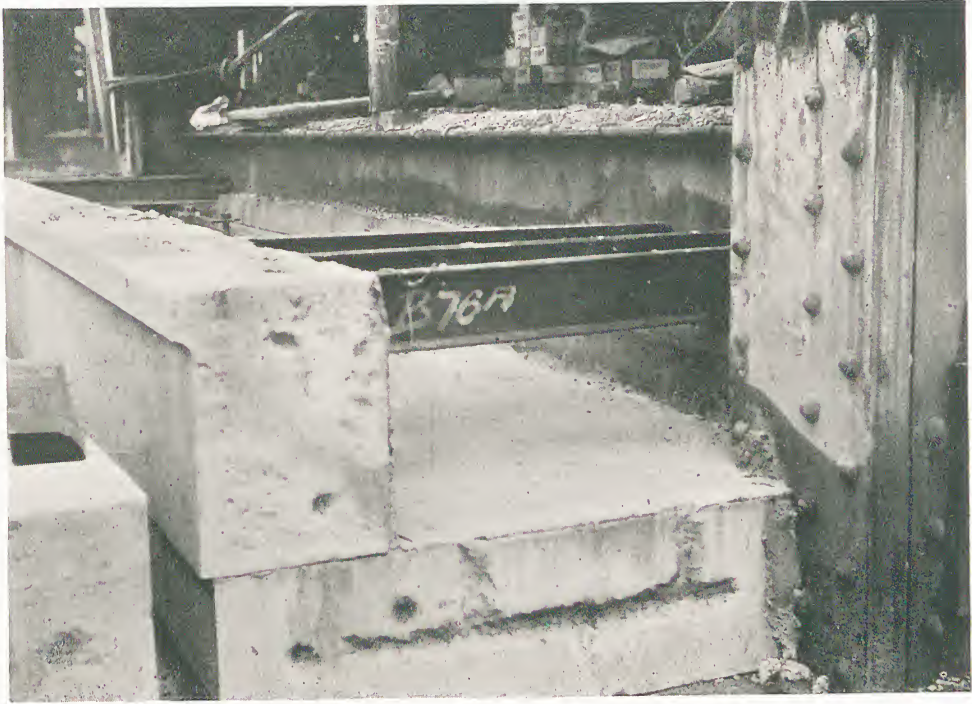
SECTION THROUGH SOFFIT AND CONCRETE LINTOL.
